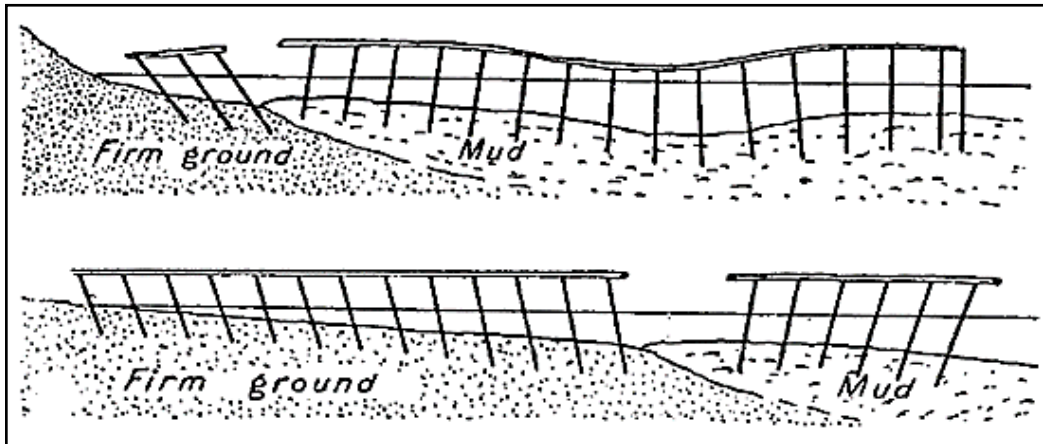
Deformation of Pile-Supported Inverness Piers due to Lateral Spreading, (Wood, 1908)
